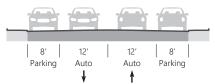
CLARENDON AVENUE, SATURN AVENUE, MIDDLETON STREET, & ARBUTUS AVENUE EXISTING CROSS-SECTION
